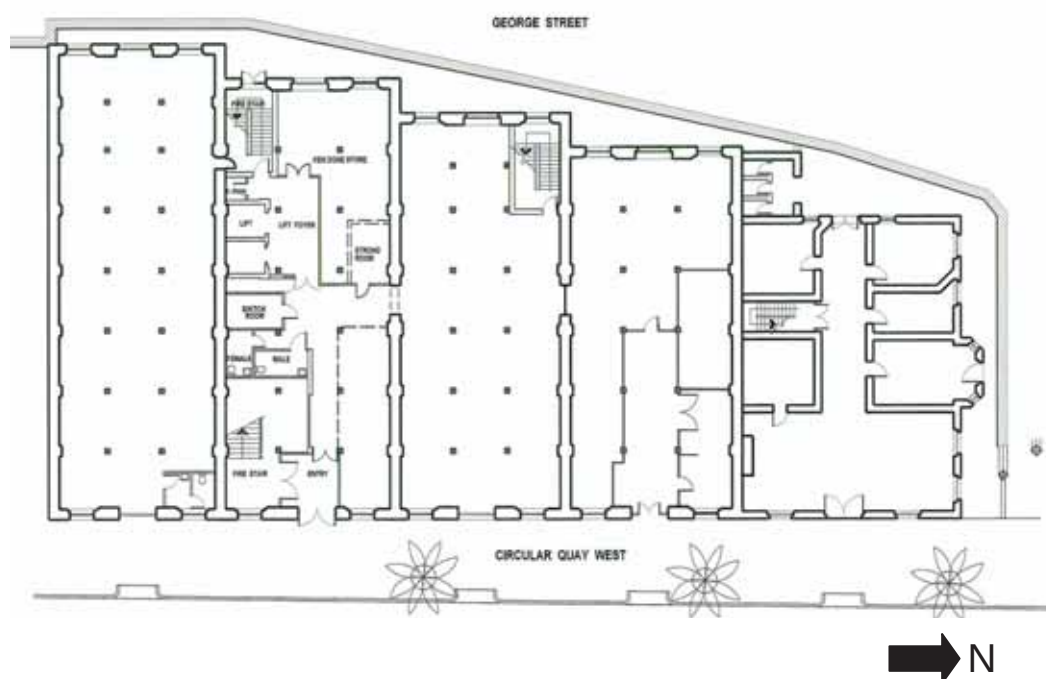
2008 Ground Floor layout of the ASN Co. Building reproduced from the measured drawings dated 26/02/04.
